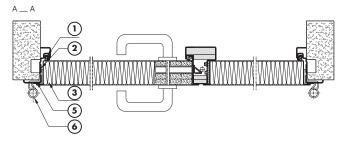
Horizontal cross-section of a large-size double-leaf seamless steel door with a corner frame
